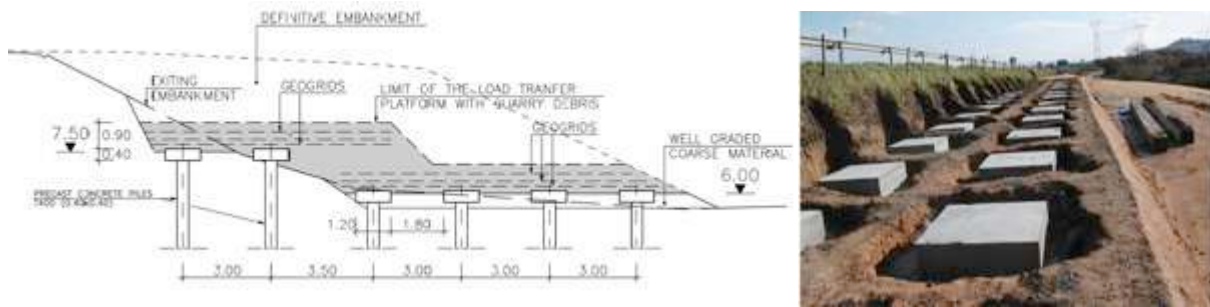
Existing old fills widening foundation solution. Cross section (left) and driven pile caps (right).
